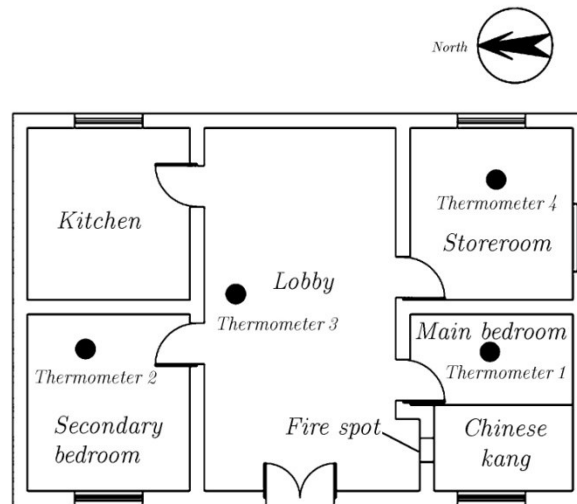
Floor plan of the objective building and distribution of thermometers
